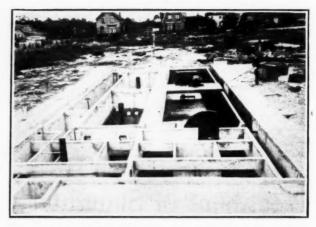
GENERAL LAYOUT OF APELDOORM PLANT
